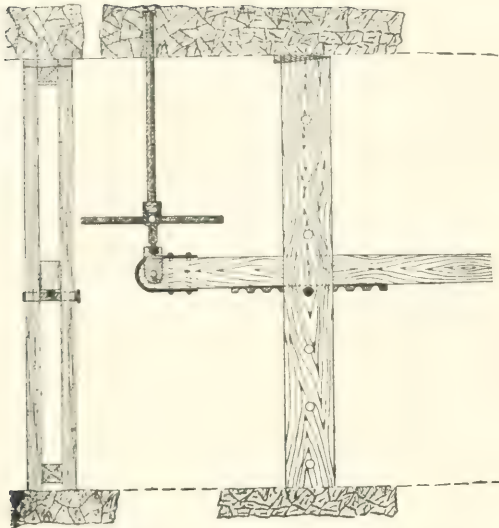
METHOD OF BORING FOR DRAINAGE PURPOSES.
